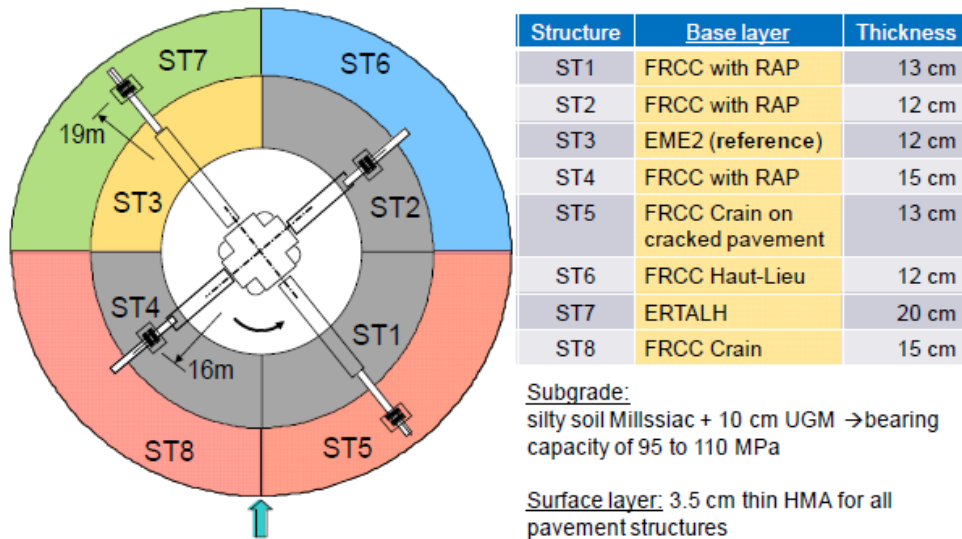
Schematic of tested structures at the IFSTTAR's ALT facility.
